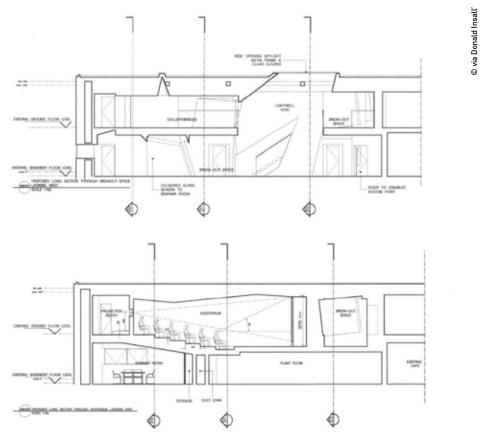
Nos. 39 and 41 Gordon Square, Proposed section plan, 2005, Camden Planning Archives
